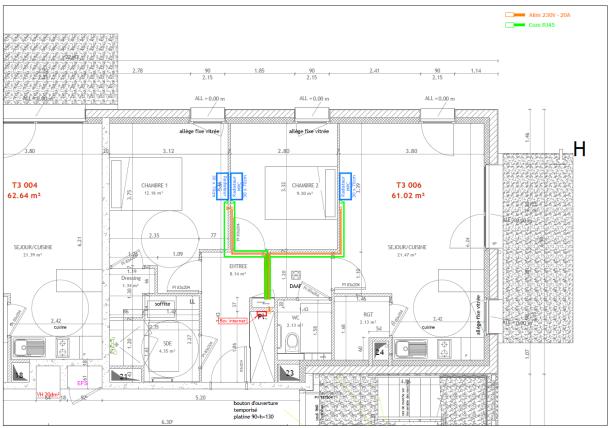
Implementation and connections of EHP in the Type 3 apartment (Ground floor South wing)
